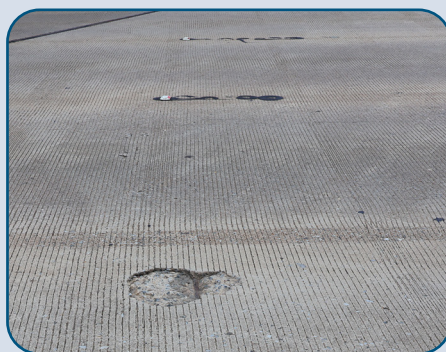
SRT NB Bridge Deck Deterioration at Coit Rd.
